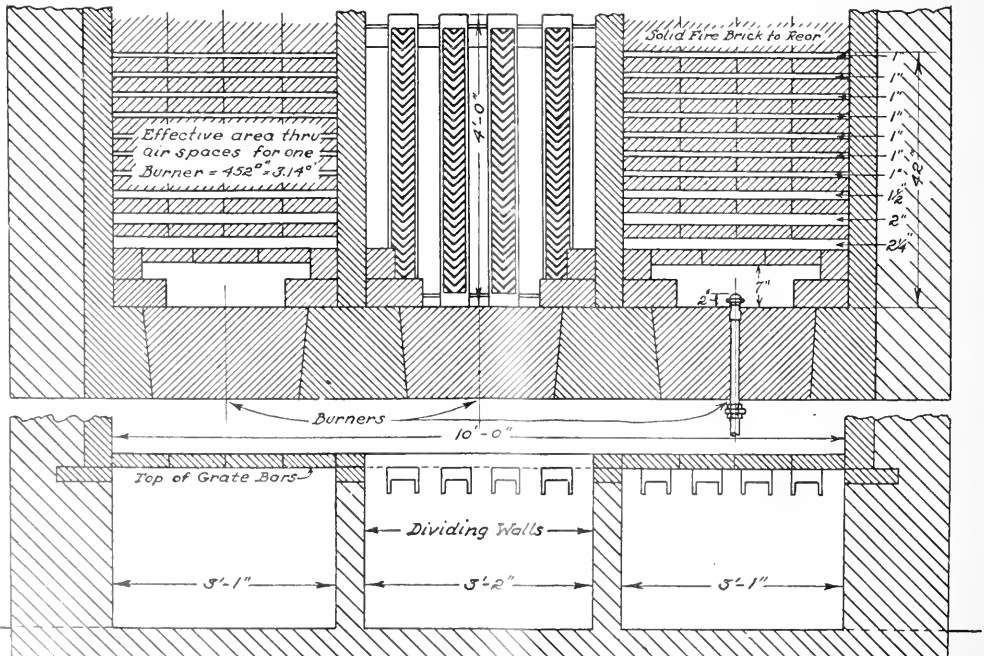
Arrangement of Air Spaces and Grate Bars in Furnace and Dividing Walls in Ash Pit.
